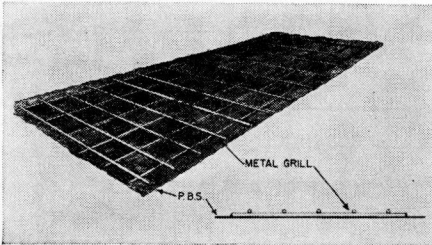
Reinforced Prefabricated Bituminous Surfacing (R.P.B.S.)
